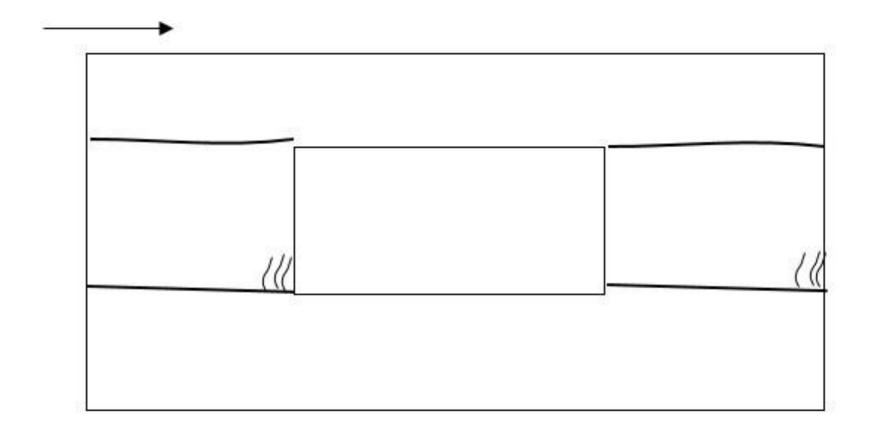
150 or 200 mm Reinforced Masonry Wall Piers Failure Mode: In-plane bending vertical toe splitting cracking and top and bottom horizontal cracking Cause: Inadequate vertical reinforcement; poor unit, joint mortar, and grout compressive strength.
